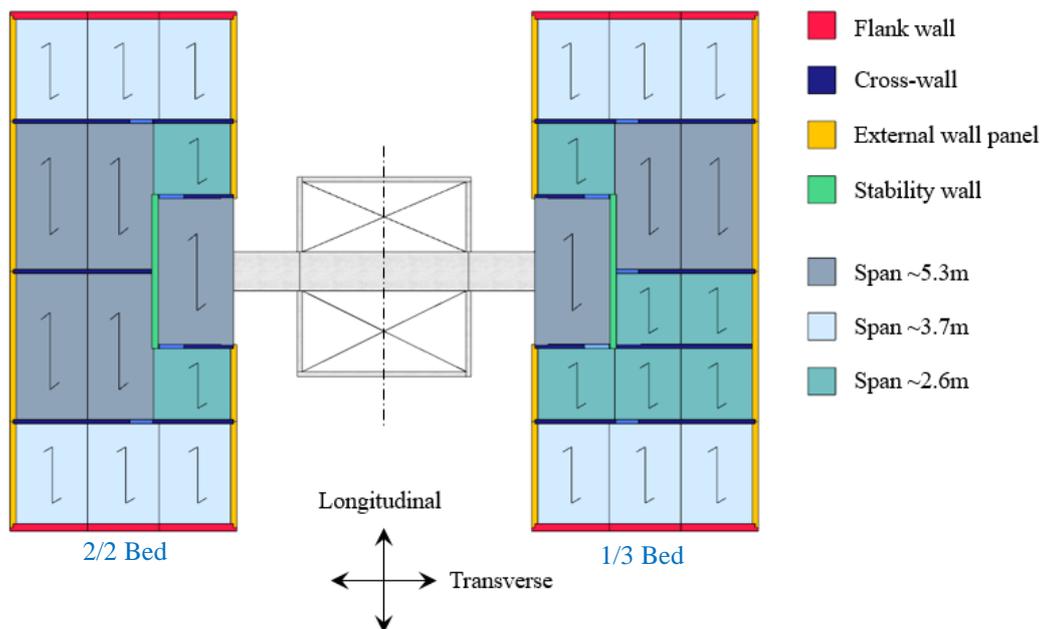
Approximate floorplan of the Ledbury Estate tower blocks, illustrating the clear span dimensions. For illustrative purposes, a one and three bedroom flat layout is shown on the same floor as a two-bedroom flat layout.
